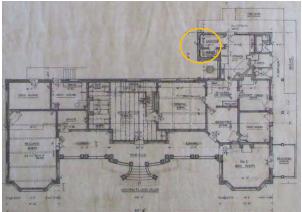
Location of subject window openings serving the ground-floor bedroom shown (circled) on the original ground-floor plan.
